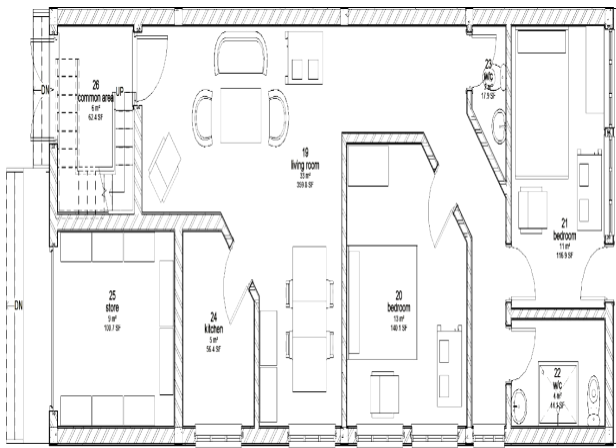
(a) Plan of Re-Designed Case House (Ground Floor)
